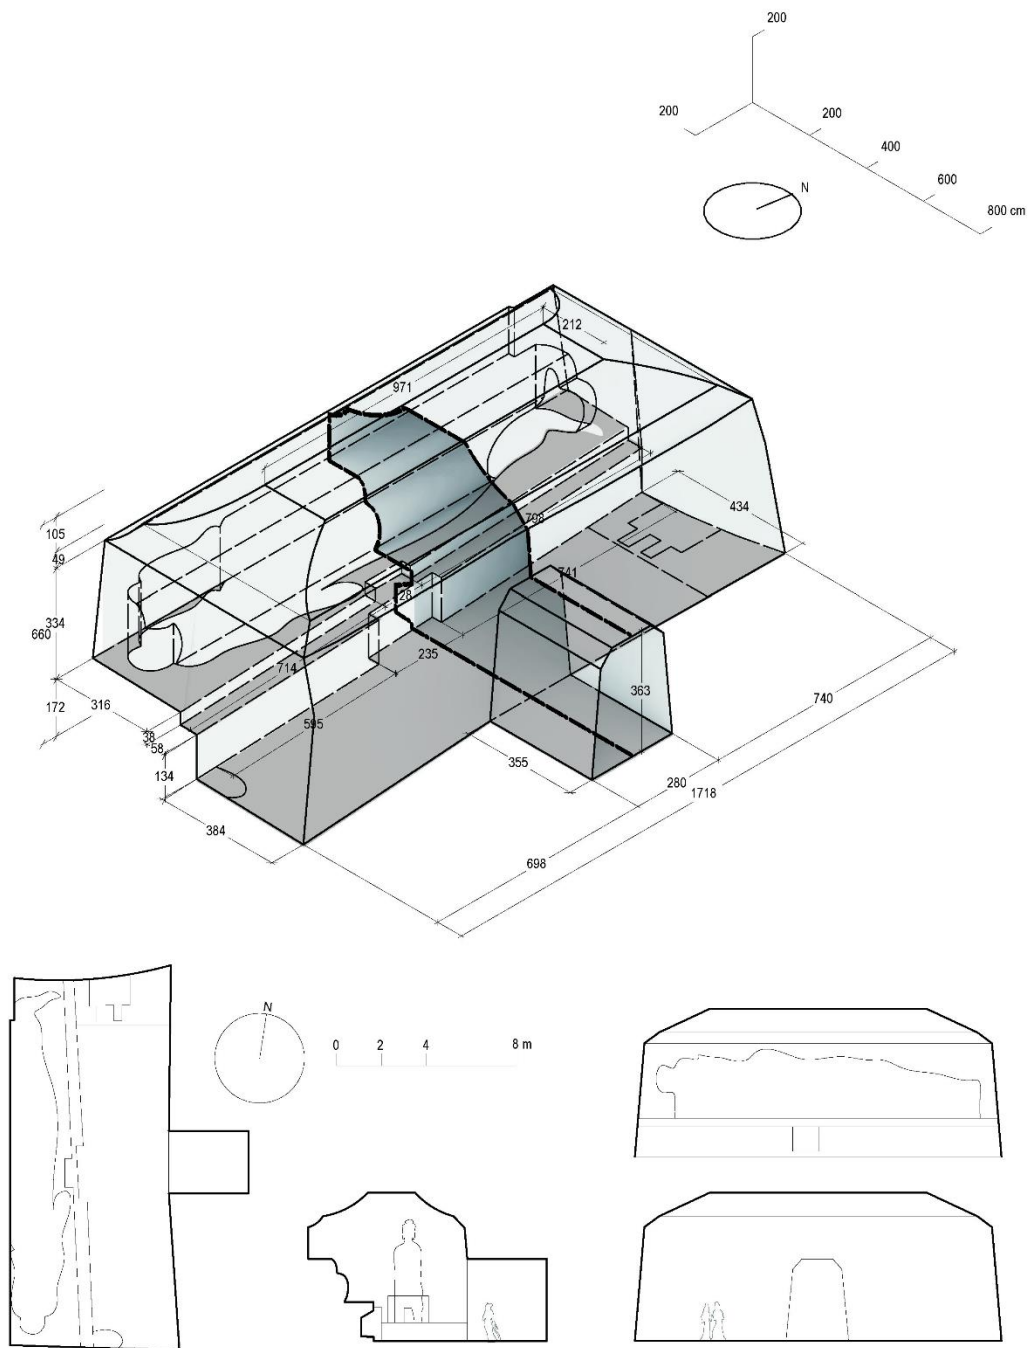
The plan, sectional, and isometric drawings of Cave 158, Tibetan period. Drawing by author.
